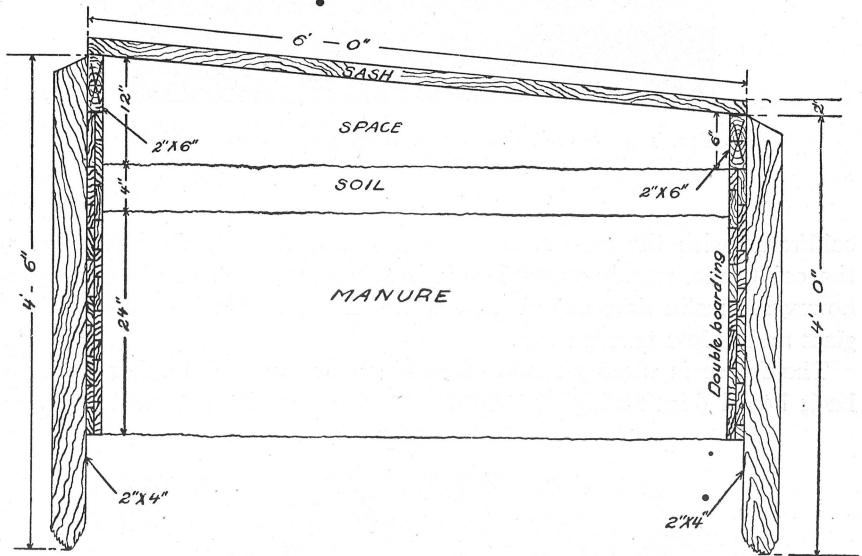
CROSS SECTION OF A MANURE-HEATED HOTBED
